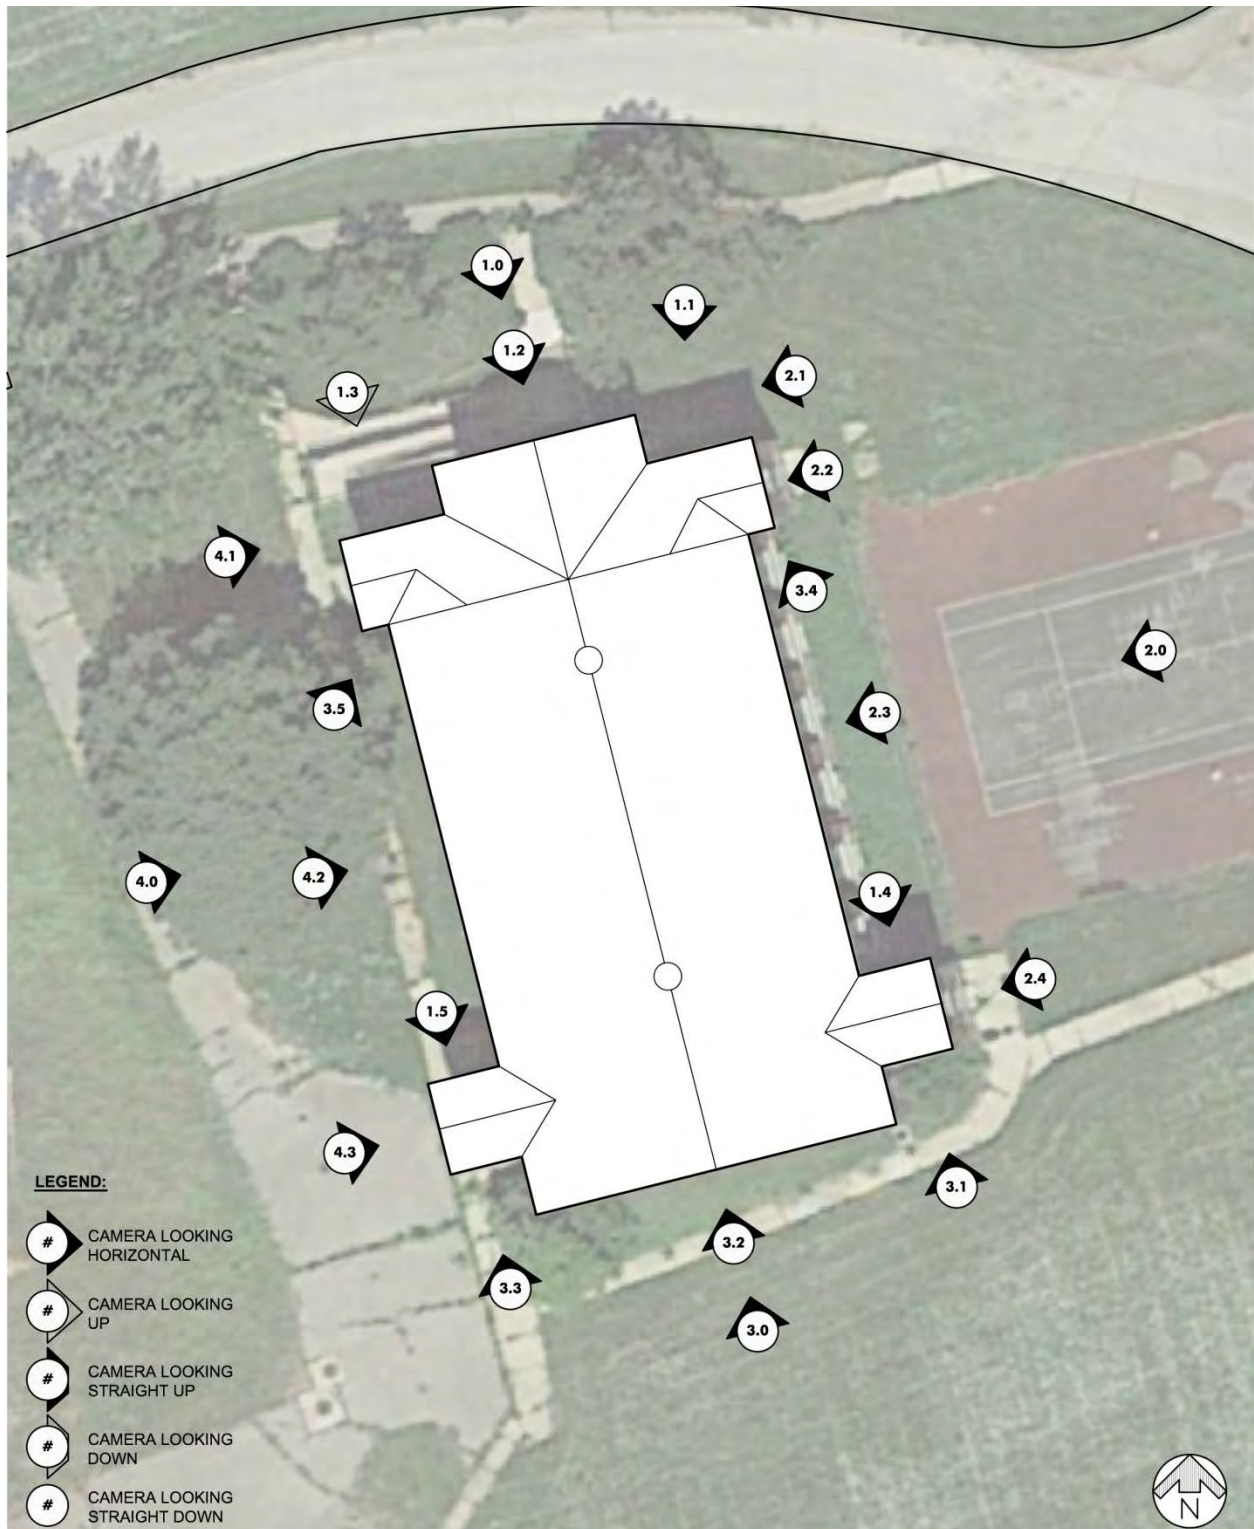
Photo No. 1.0 – 4.3 (Elevations)
